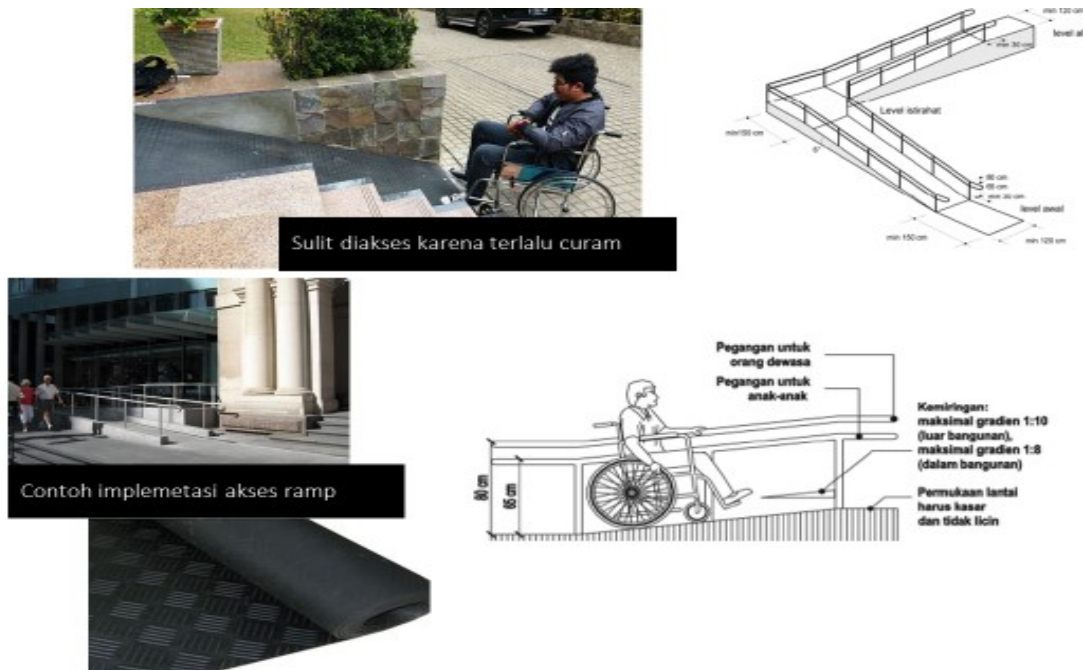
Ramp drop off to lobby at Tower building doesn't meet the universal design principle standards because ramp is too high will be difficult to access by wheelchair users. The proposed design on the detail picture is ramp and the material is not slippery.
